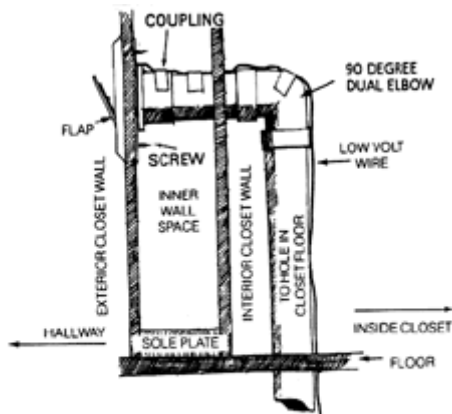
INNER-WALL CLOSET ASSEMBLY - INSTALLED
